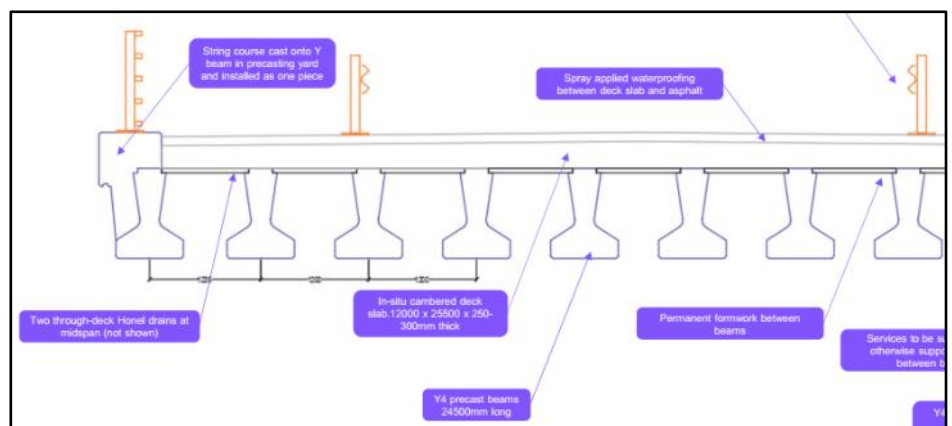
Indicative section through deck showing the TYE4 beam with the precast string course.
